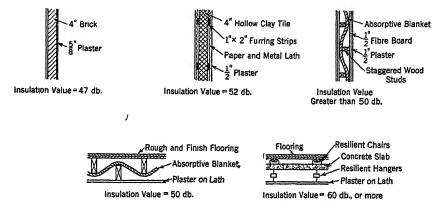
Three Wall Sections and Two Floor and Ceiling Sections which are Suitable for the Insulation of Equipment Rooms^a
